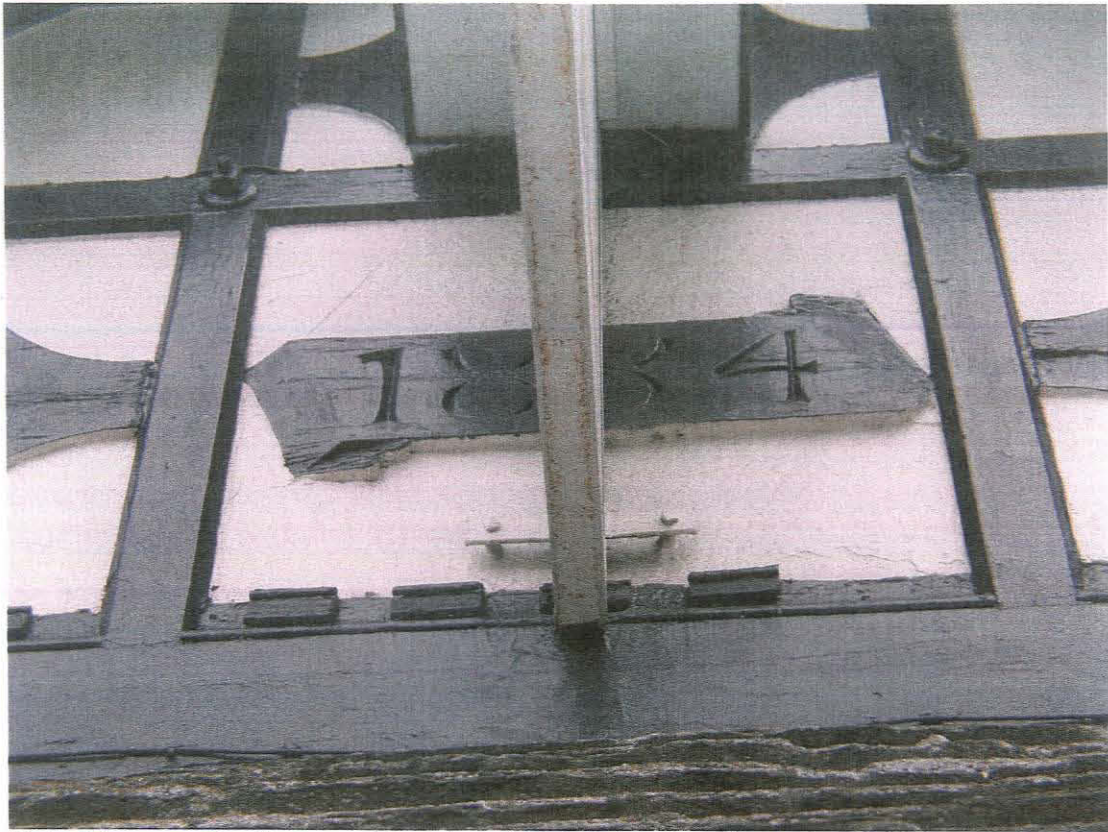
Detail on west elevation of Unit 6 showing plaque above the door dating the façade to 1884, taken from the west (126)
